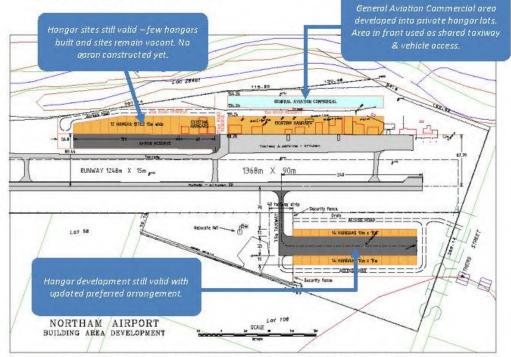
Building Area Development Plan from Northam Master Plan - June 2006
